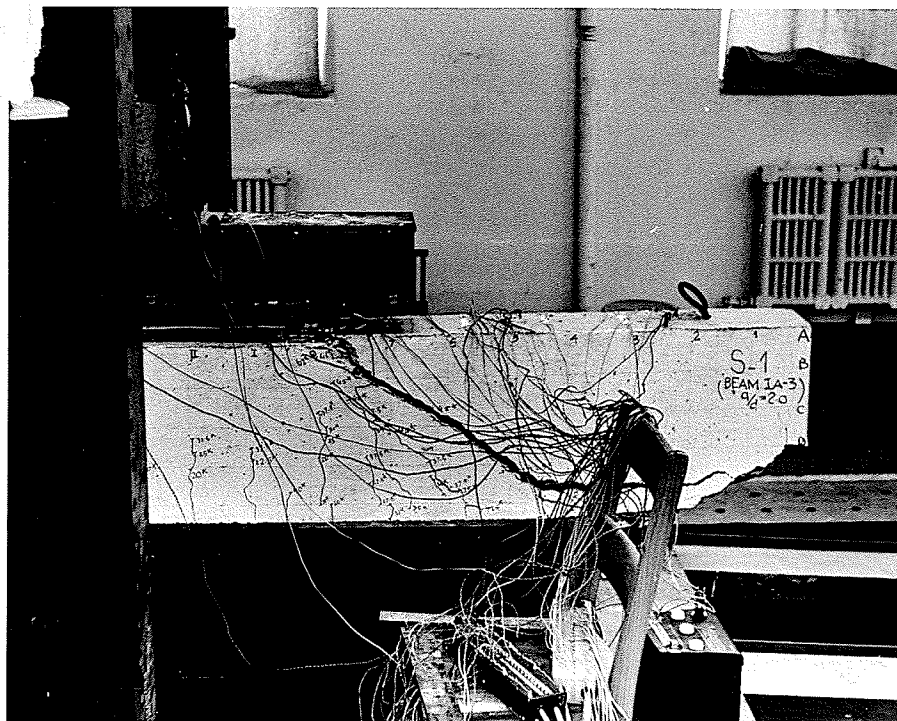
BEAM IA-3 SHOWING CRACKING AND FINAL FAILURE ON END S1
